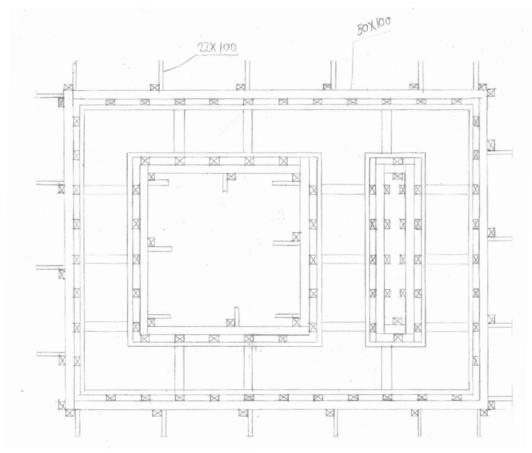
Design for the formwork. Engineering students plan more complicated than they build... compare with figure 2.6.
